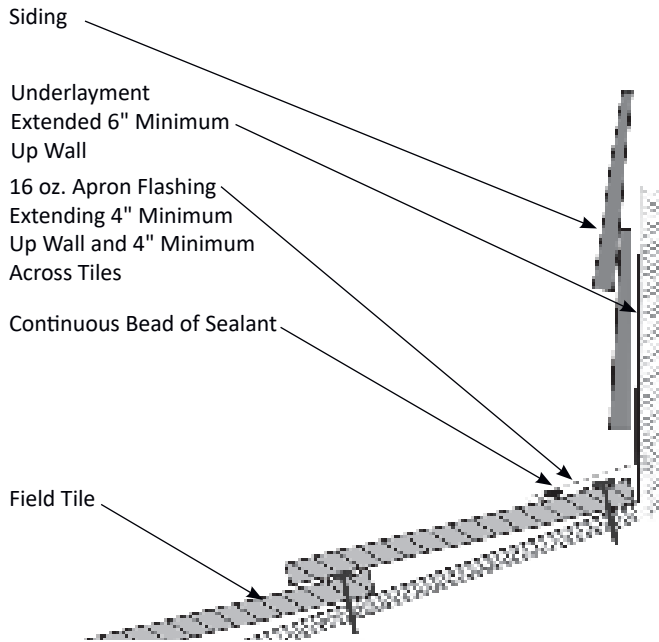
Apron Flashing at Siding Head Wall Detail
